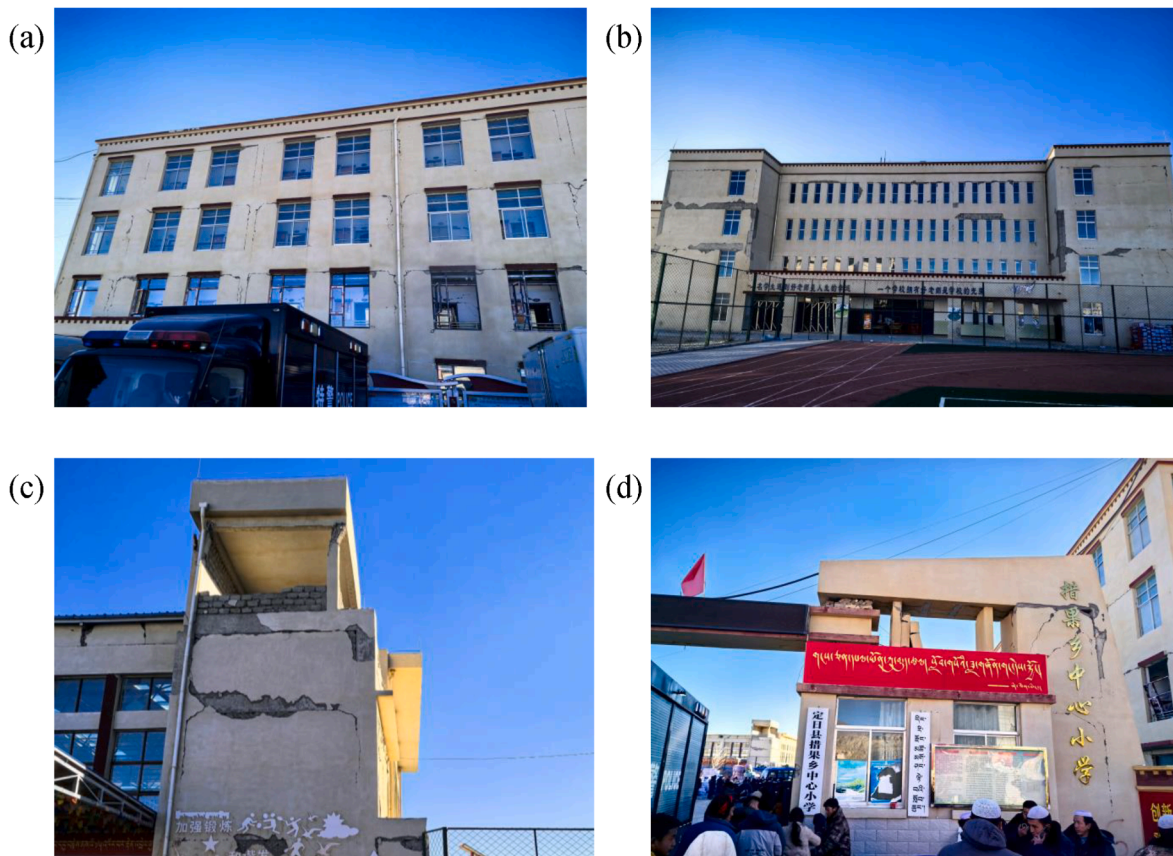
Structural damages of Central Primary school in Cuoguo Town, (a) teaching building, (b) office building, (c) gymnasium, and (d) school gate.
